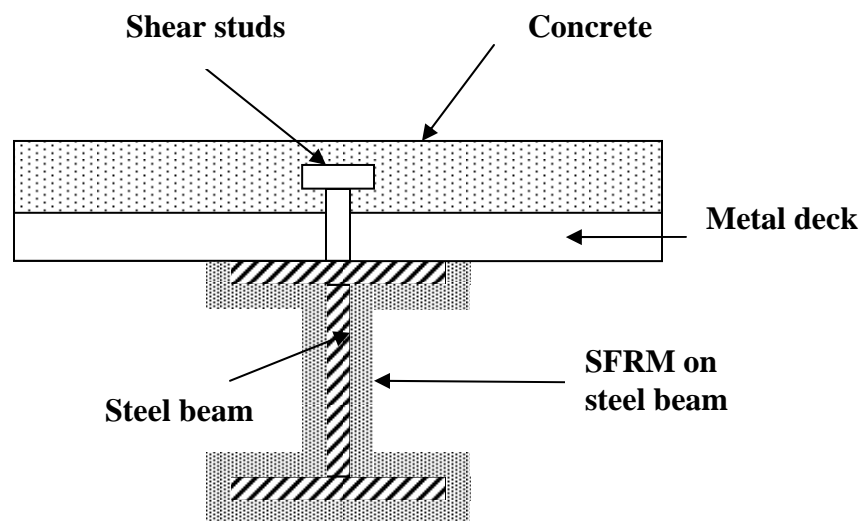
Cross-section of concrete/metal deck & steel beam composite floor assembly.
